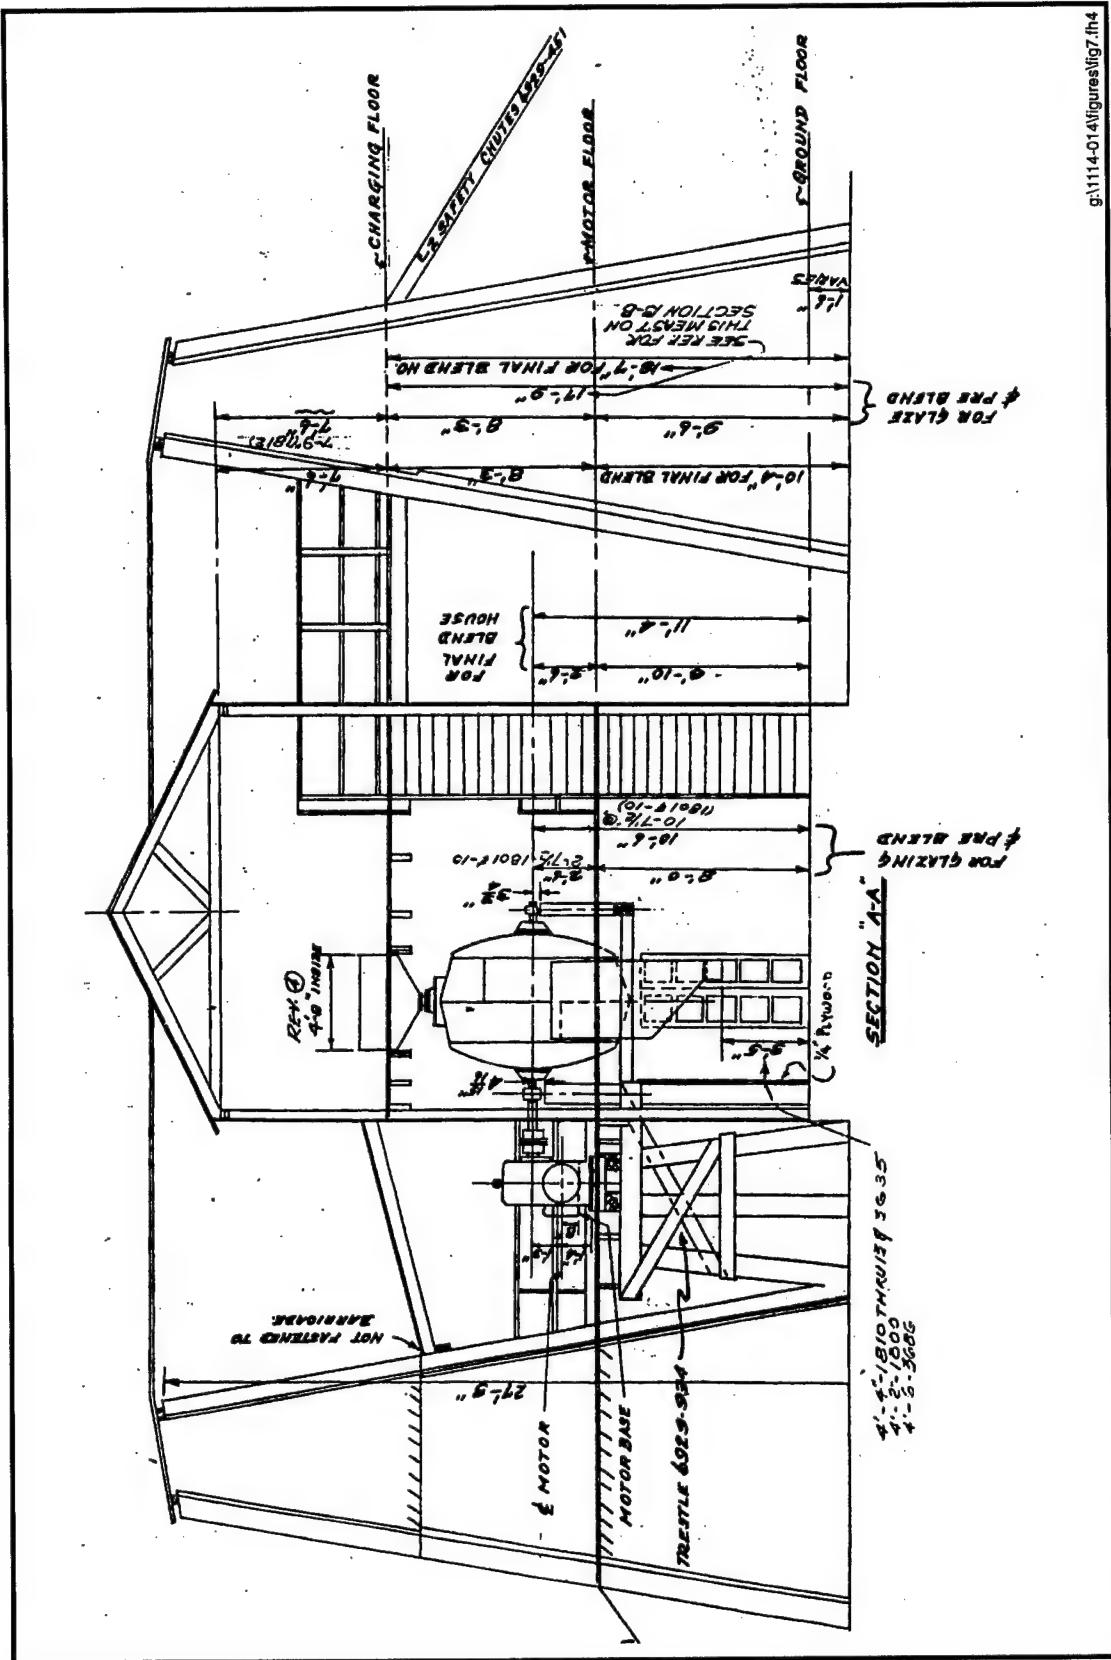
Interior elevation of Building 1800, the Glazing House, where rifle powder was glazed with graphite (1940 HPC Drawing #6929-632).
